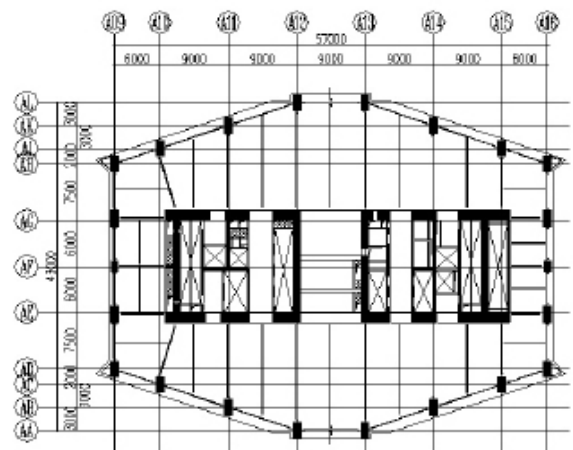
Plan of the standard floor (Source: Fujiang Xu)
